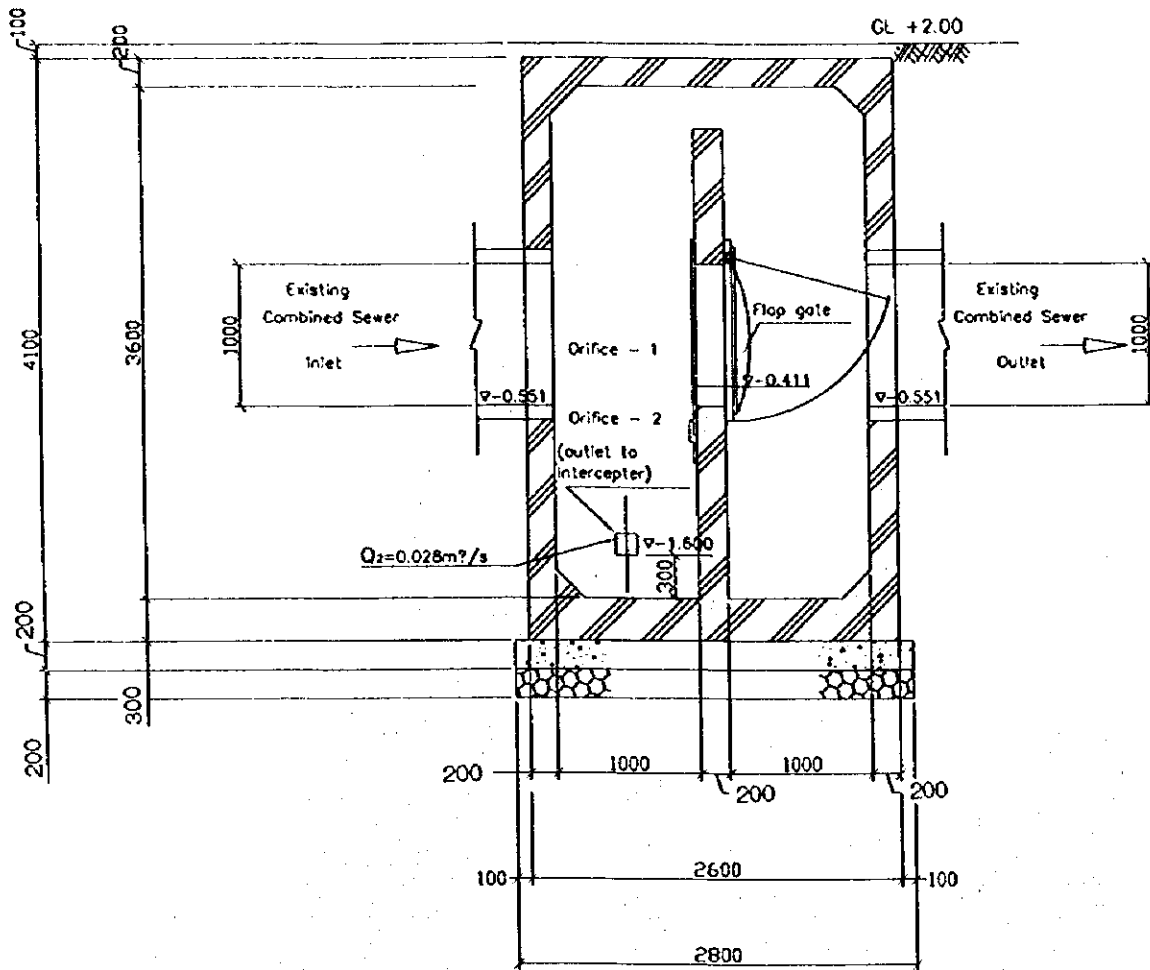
PROPOSED TYPICAL SECTION DIVERSION CHAMBER
